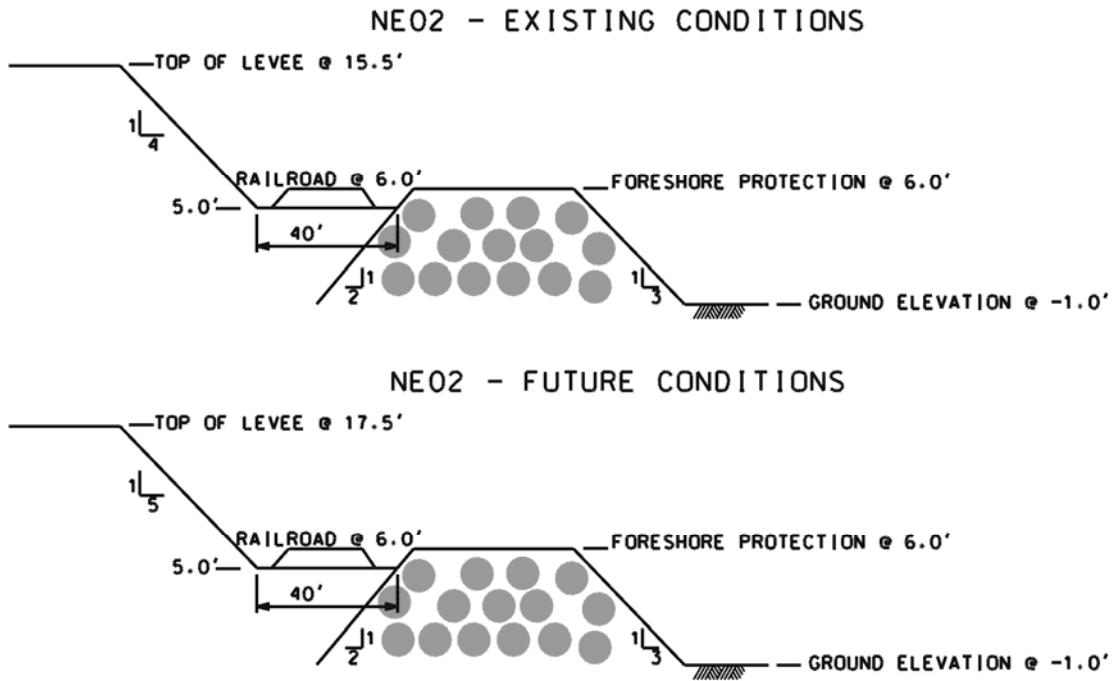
Cross-section profile for New Orleans East Lakefront Levee (NE02) for existing (upper panel) and future conditions (lower panel).
